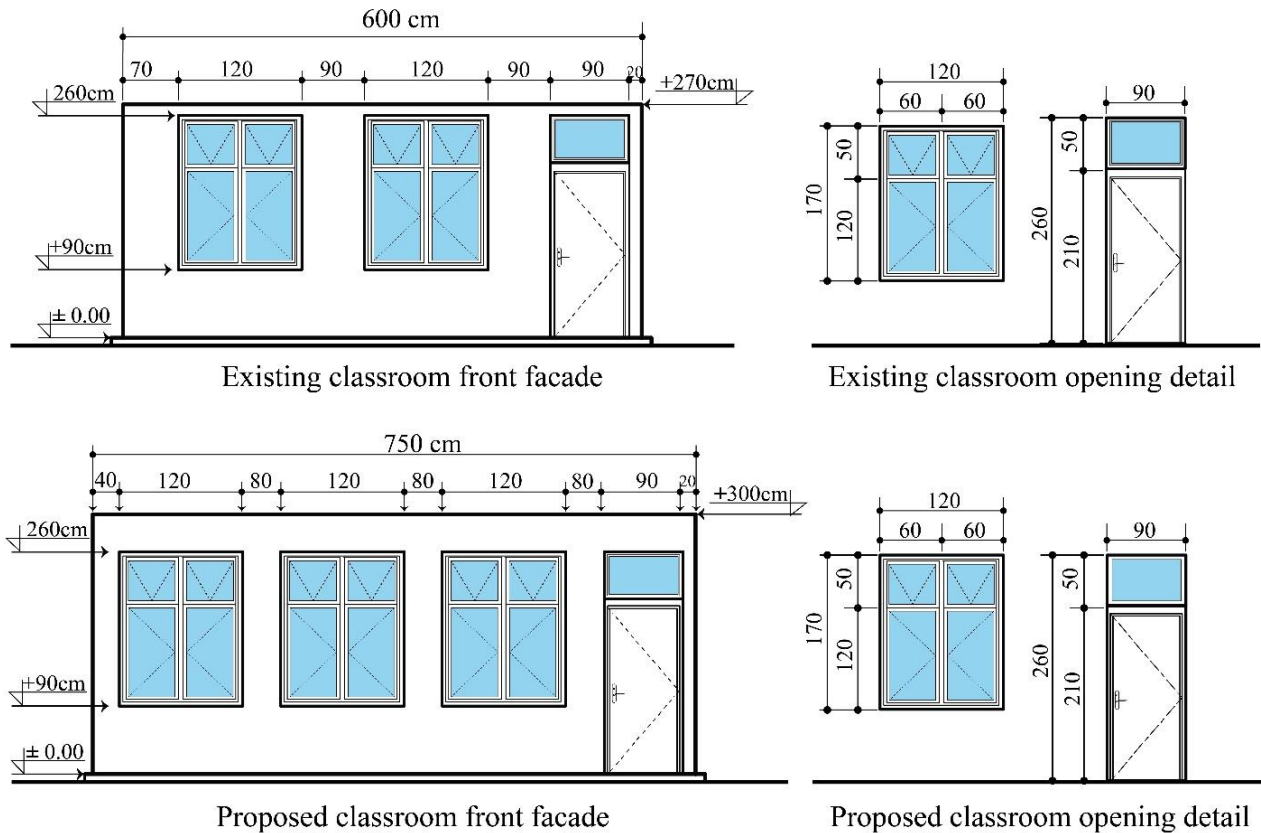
11 Existing and Proposed Windows and door detail dimensions (Source: Author & (Bekele 1966))
